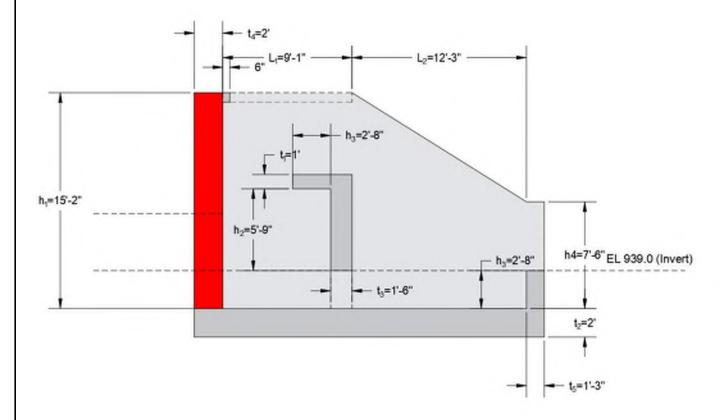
Impact Basin Cross Section and Headwall (In Red)
